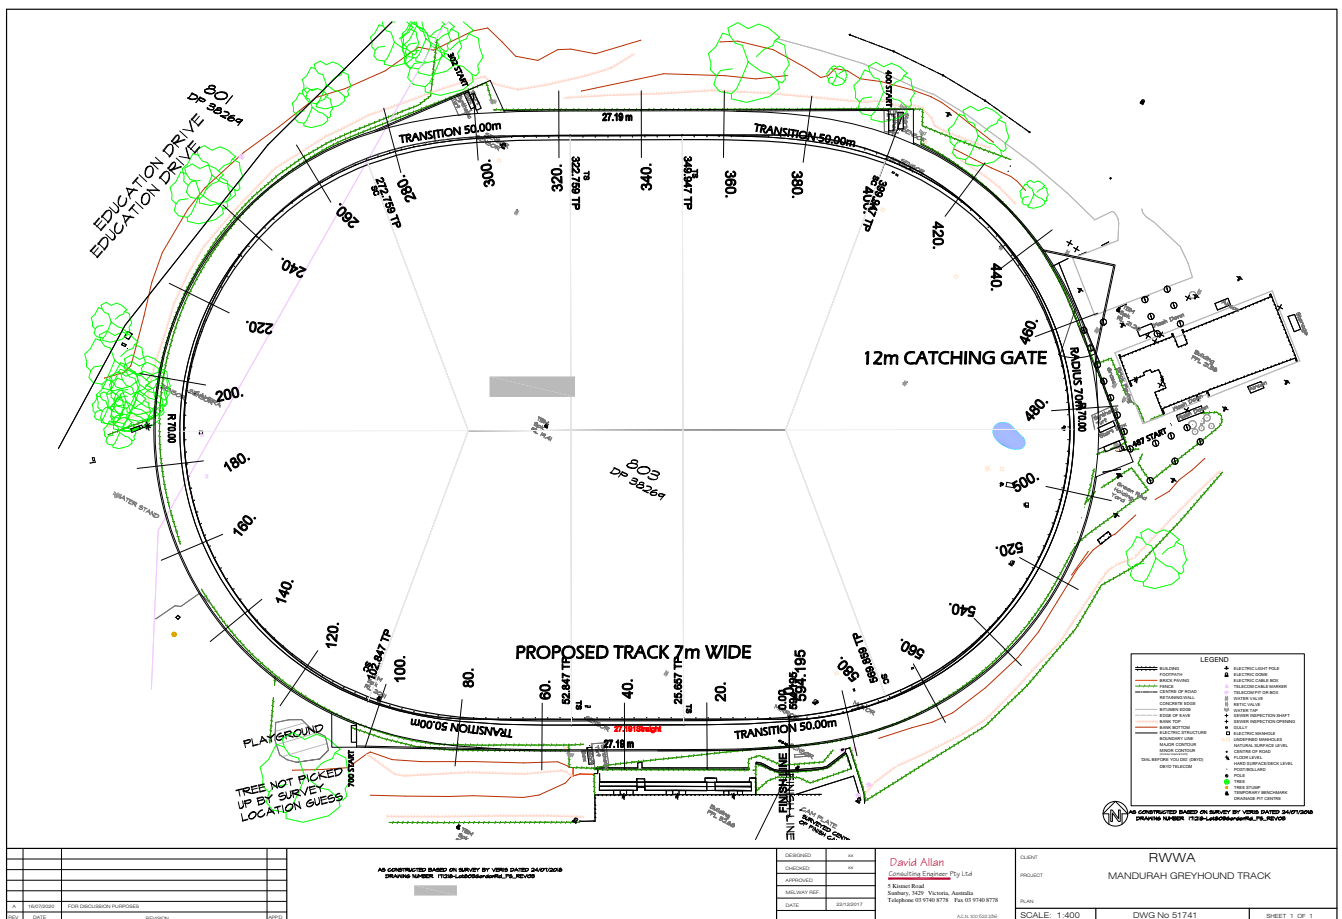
Design 1 Mandurah greyhound track plan David Allan Consulting Engineer Pty Ltd (13 February 2021).
